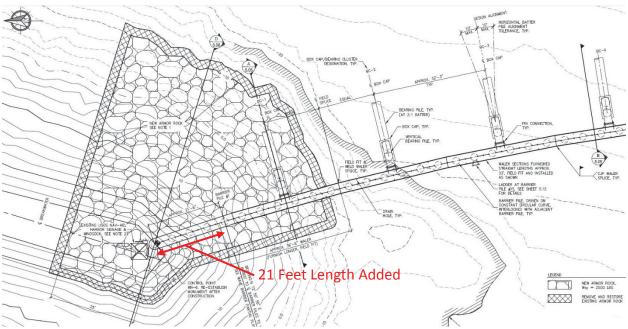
Alternative 2 Partial Plan - PCHE Wave Barrier without Gap (Length 654 feet)
